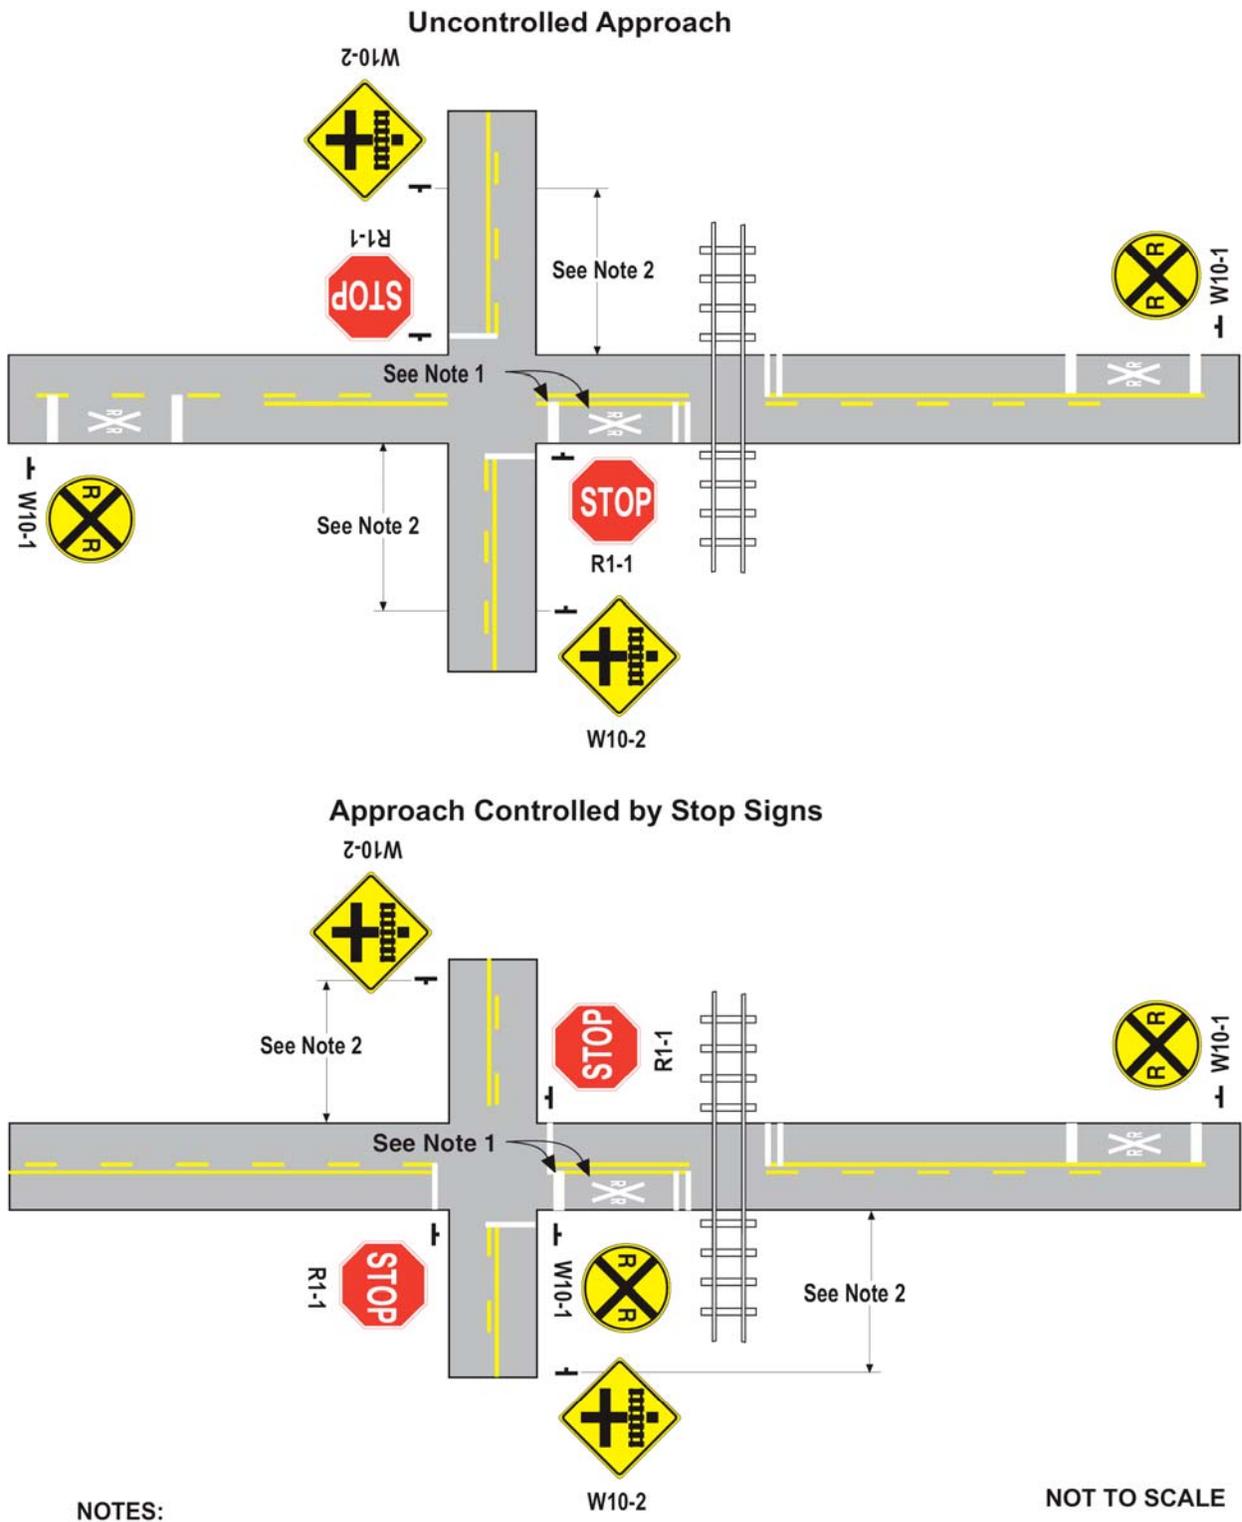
B-6 (CA). Example of Placement of Warning Signs and Pavement Markings at Highway-Rail Grade Crossings (Sheet 1 of 4)
